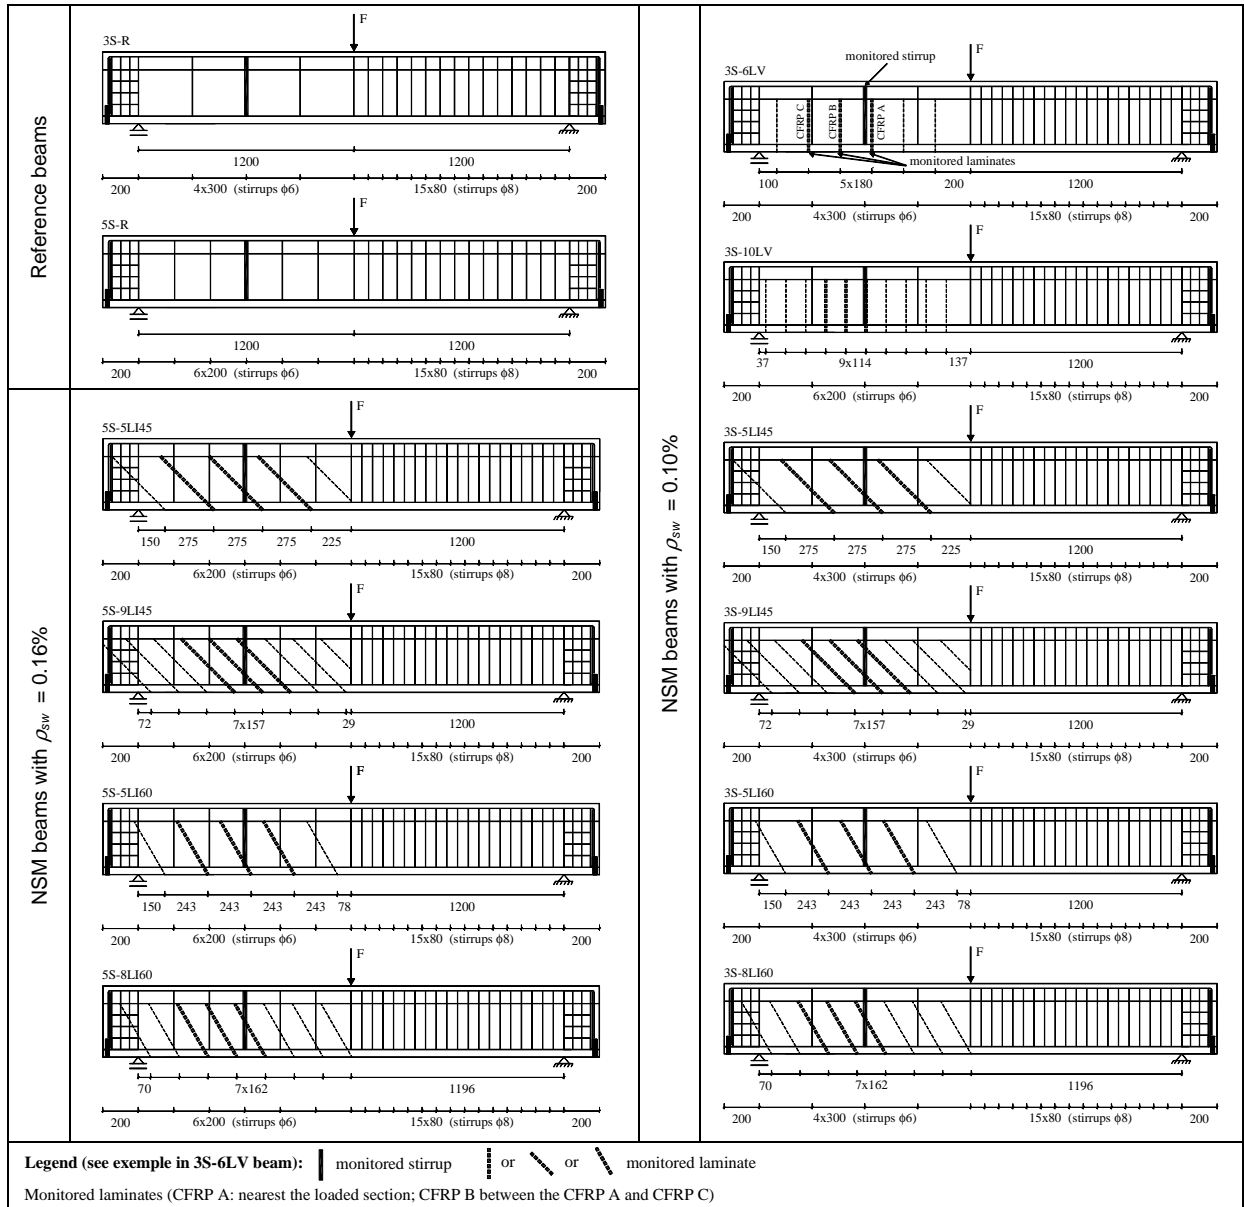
Geometry of the type of beam, steel reinforcements common to all beams, support and load conditions (dimensions in mm).
